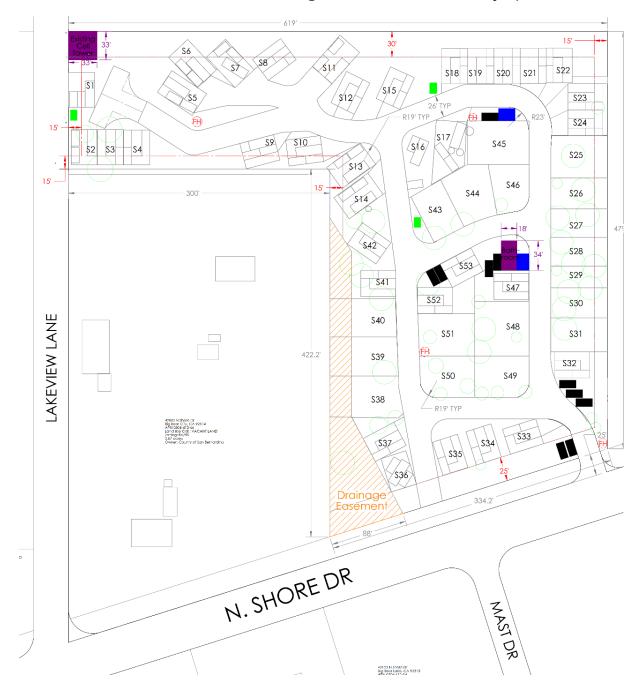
Pine Tree Park Expansion Project Site Plan
